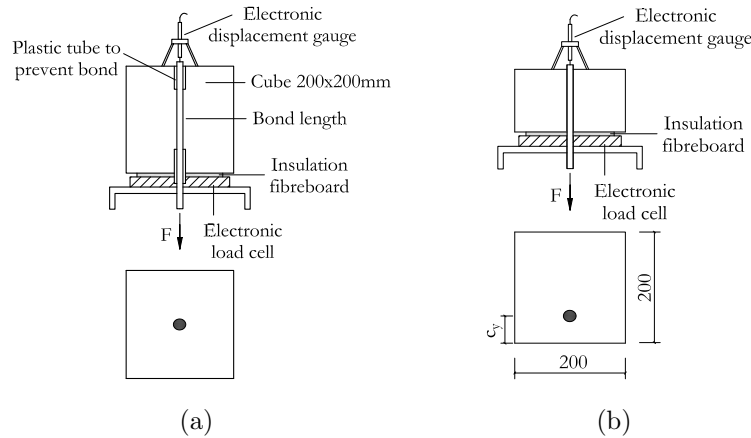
Pull-out test specimens with (a) central and (b) eccentric placement of bar (after [32]).
